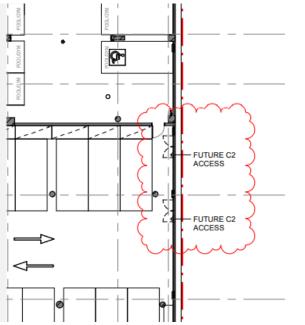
Stage 1 Mod 5 – C1 Basement 3 Floor Plan, Rev E
